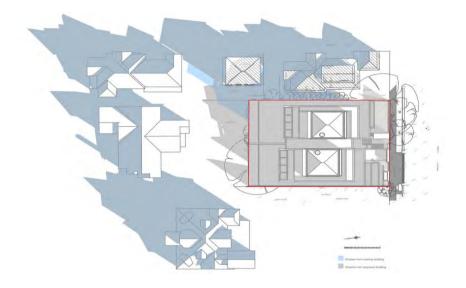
Existing and proposed shadows cast by the proposed development 9am June solstice.
